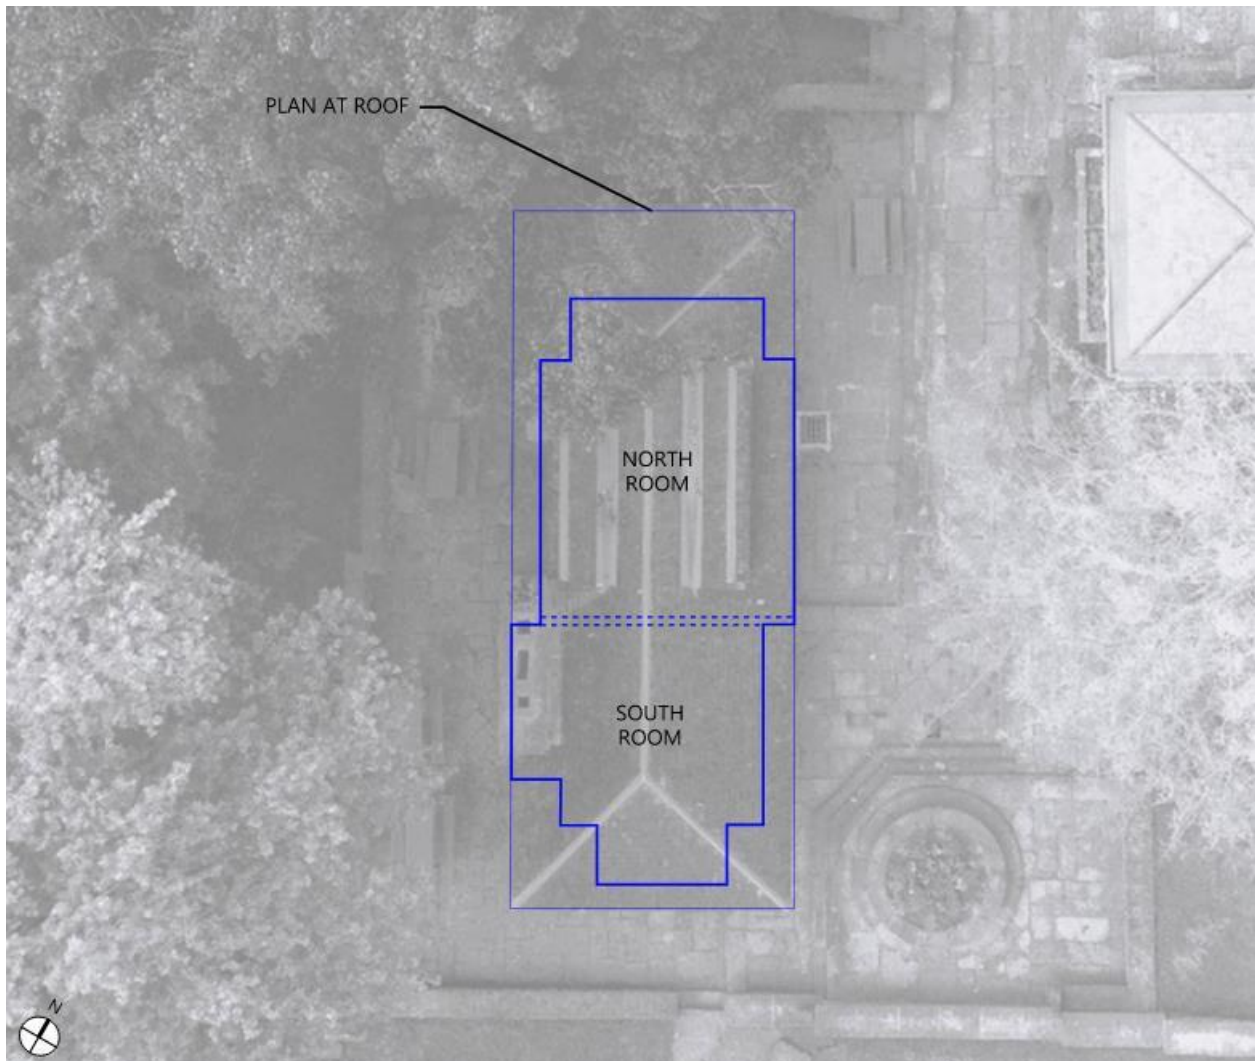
Interior plan diagram of the Veranda Rooms (Source: WJE, 2024).
